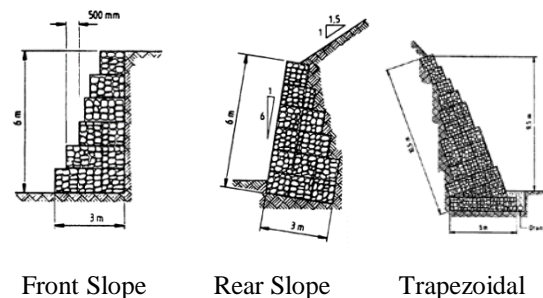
Gabion Wall Shapes, BS8002 [3]
